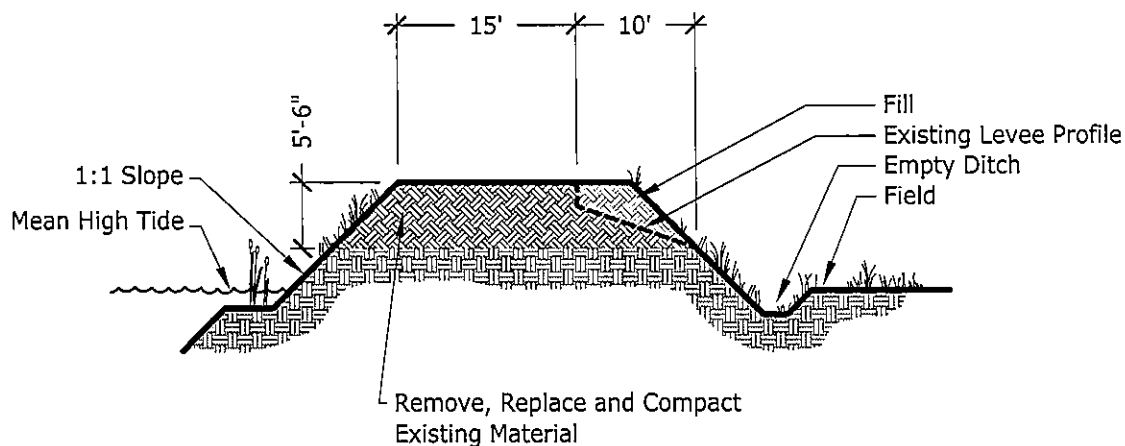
Typical Levee Repair Cross Section - West and North Levees
